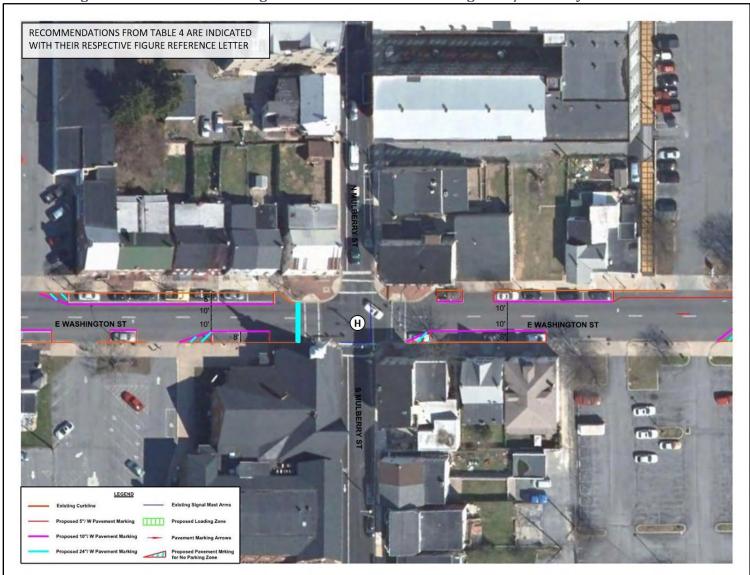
Pavement Marking Recommendations at Washington St/Mulberry St Intersection
